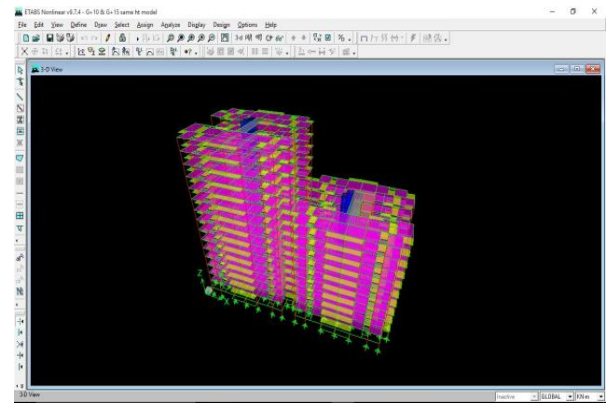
3D View -Ten and Fifteen storey adjacent buildings created in ETABS.
